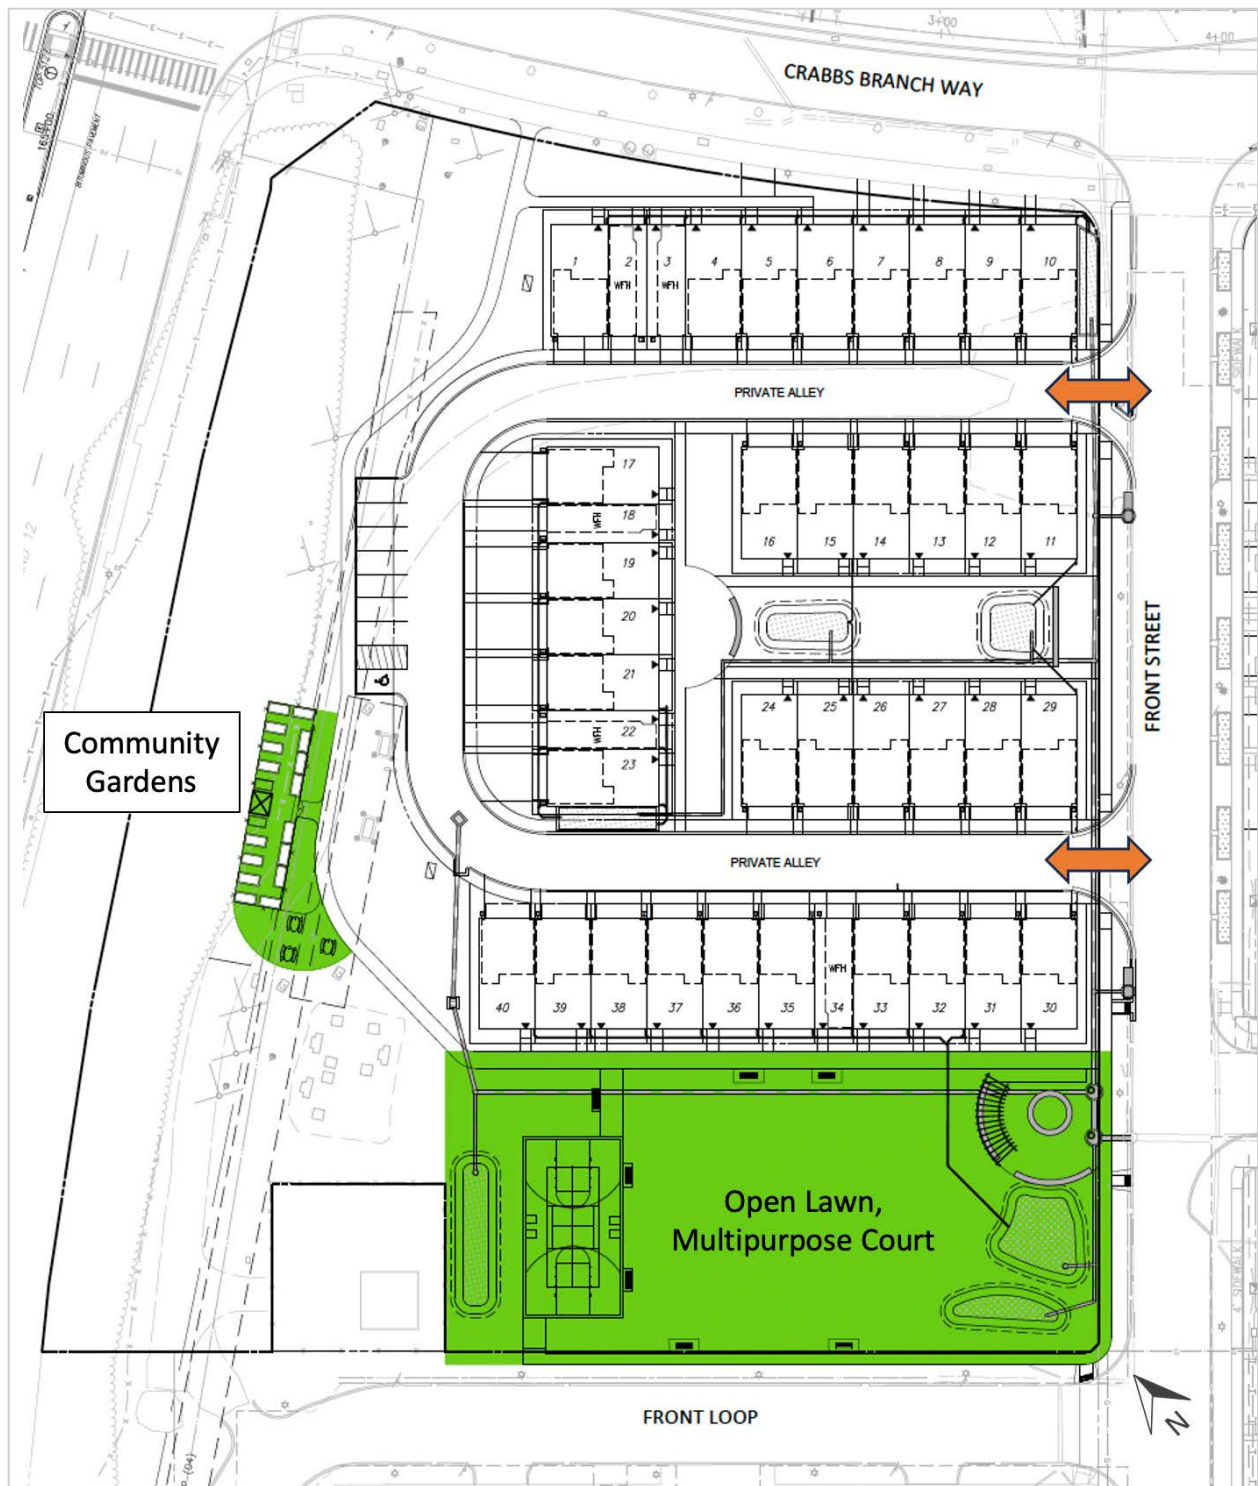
Proposed Site Plan with 40 townhouse units and public use space
